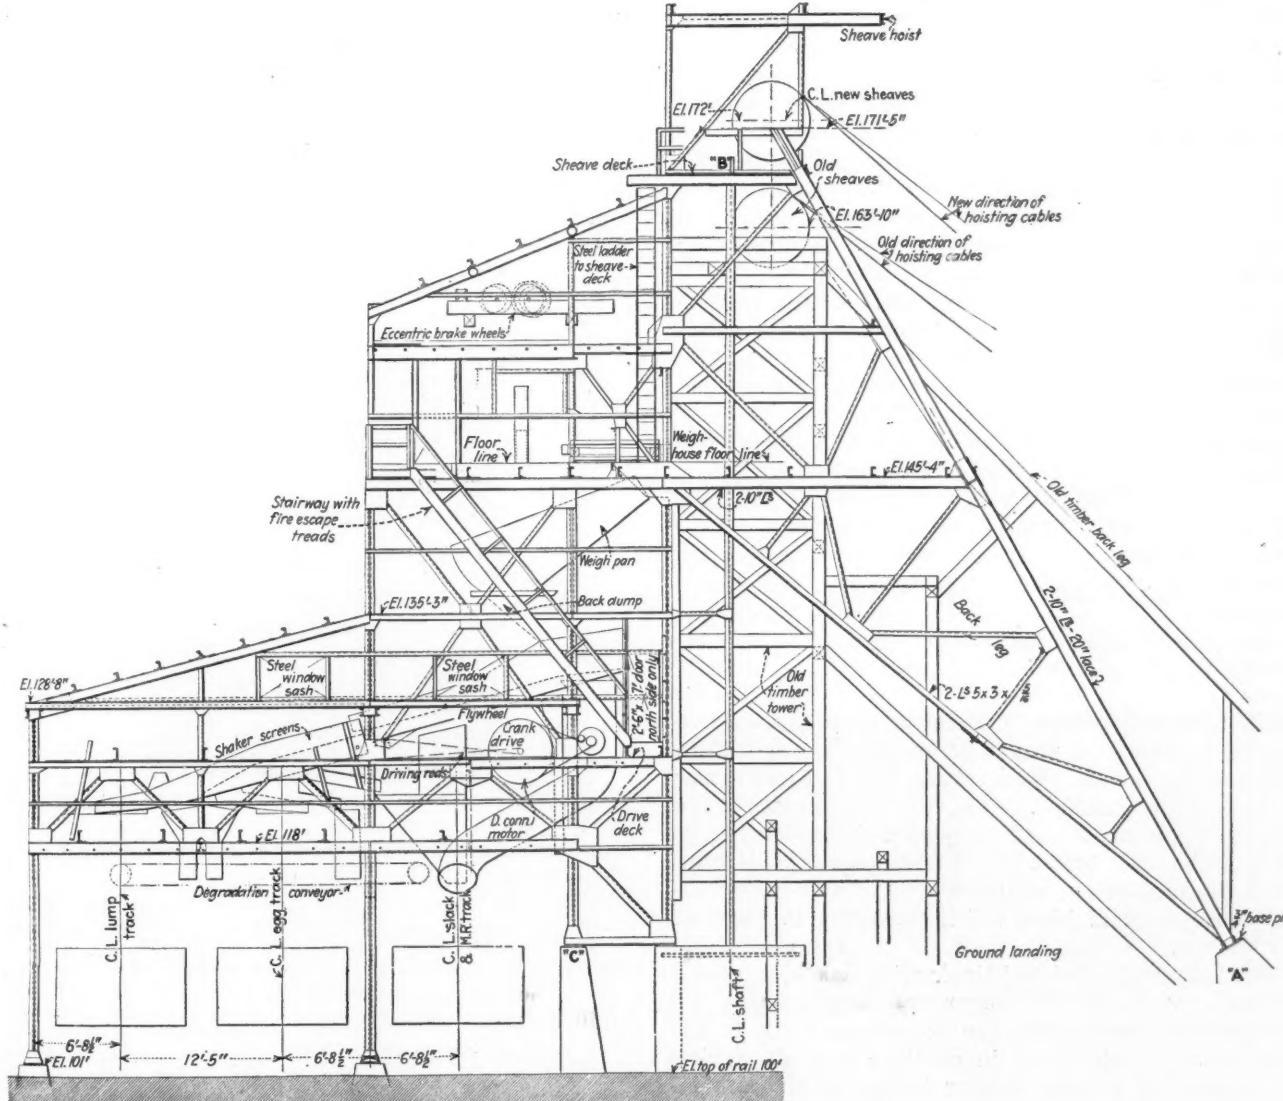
ELEVATIONAL SECTION OF NEW AND OLD TIPPLES, SHOWING SCREEN-HOUSE DETAILS
